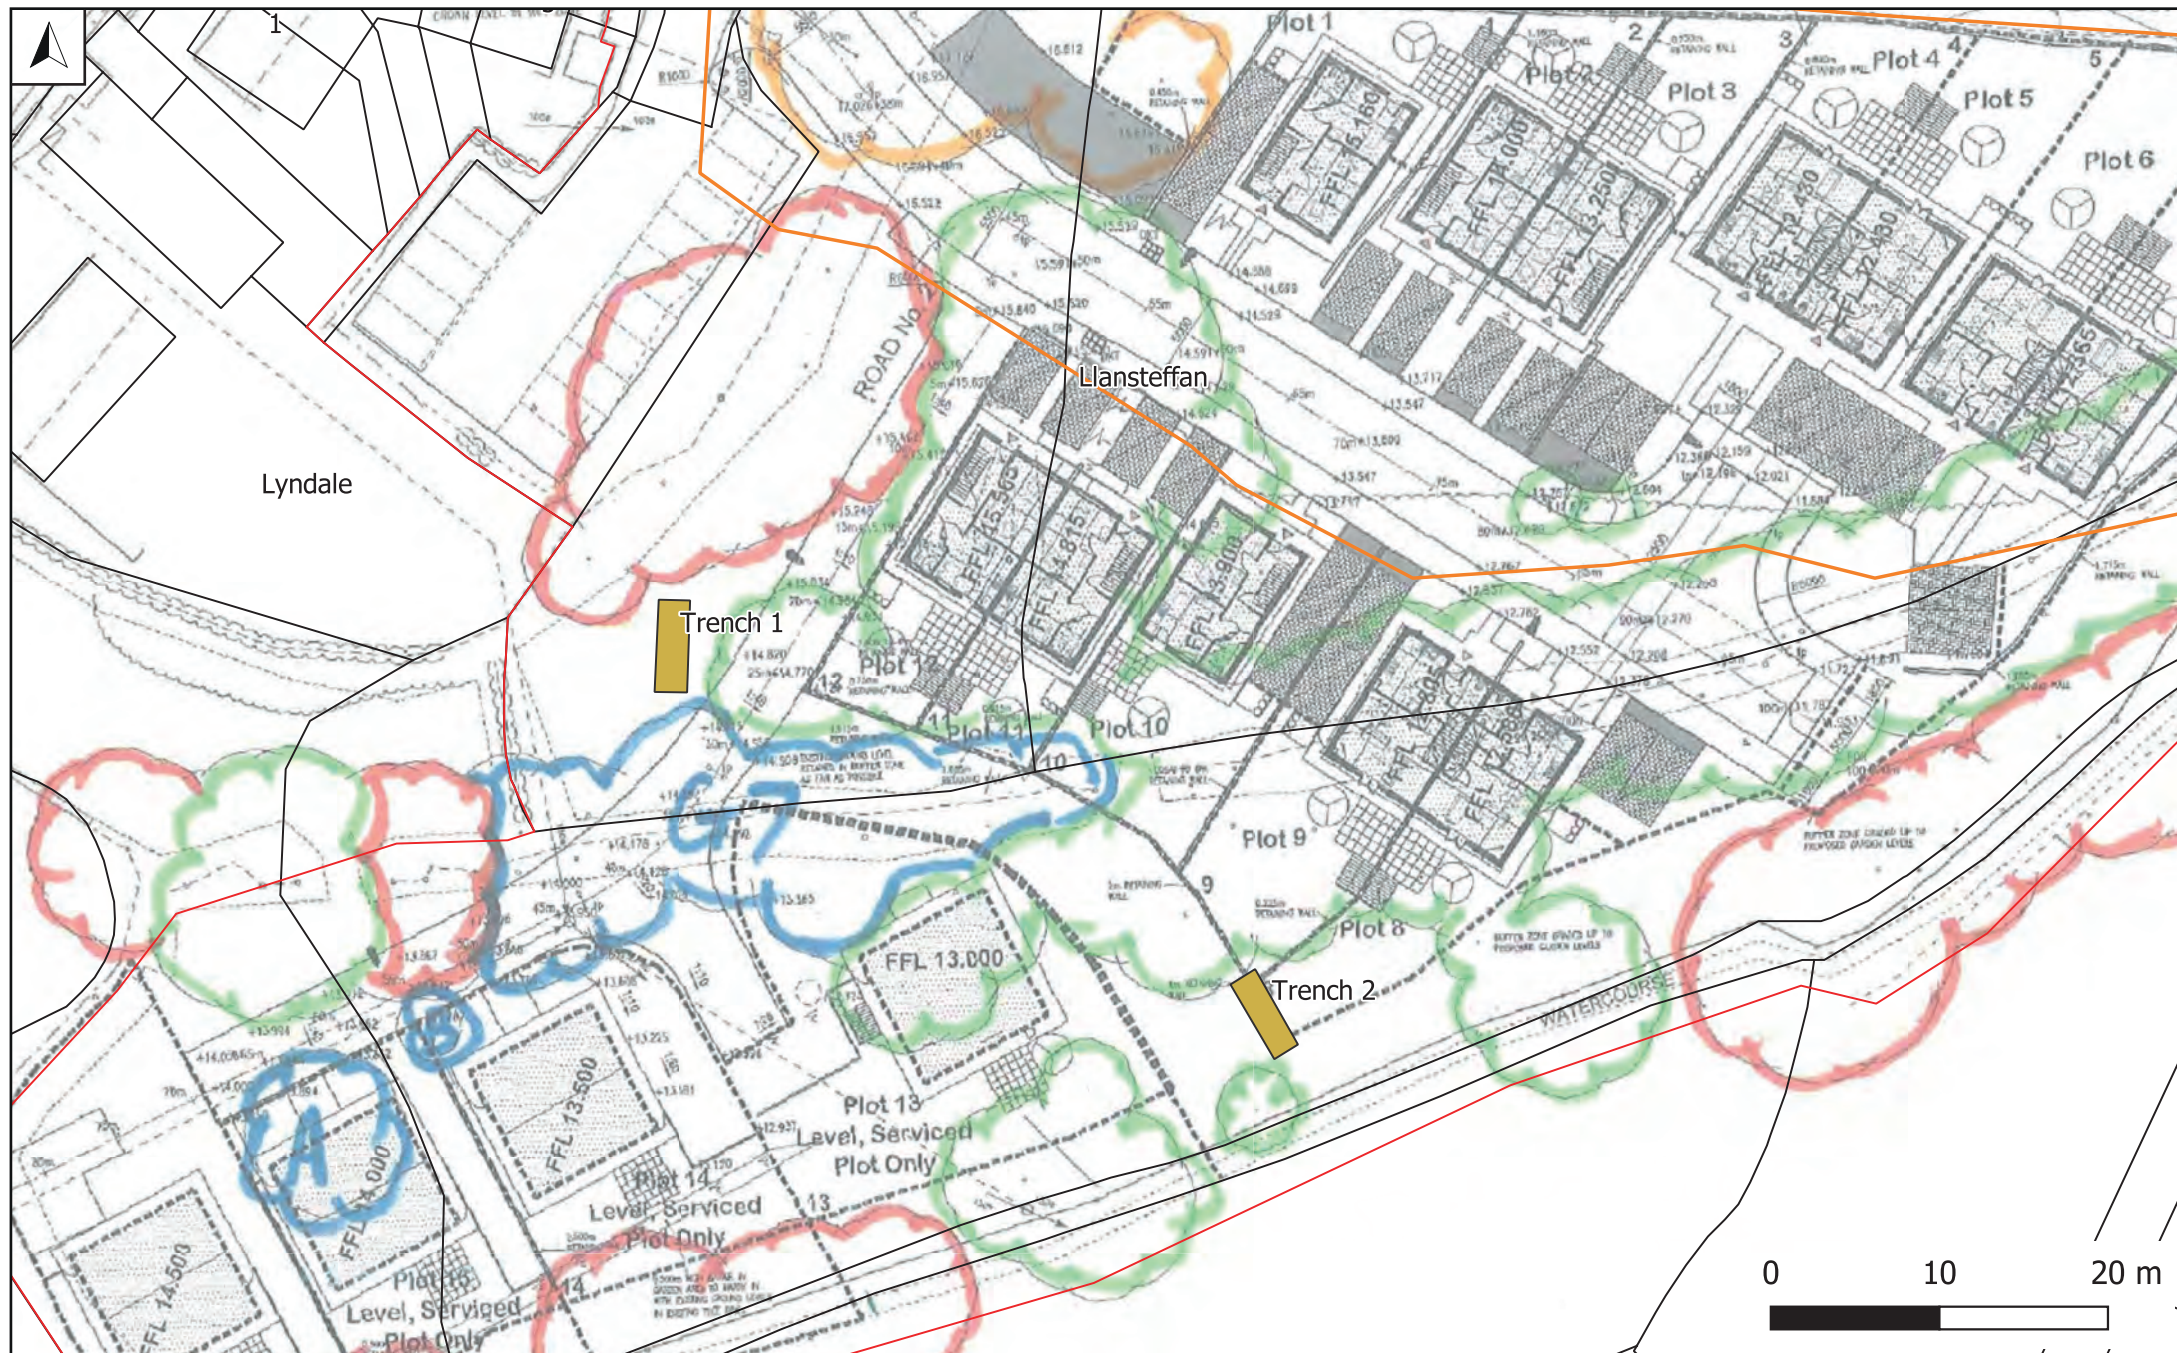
Proposed Trench Plan overlaid on Proposed Development Plan. Showing constraints (trees).
